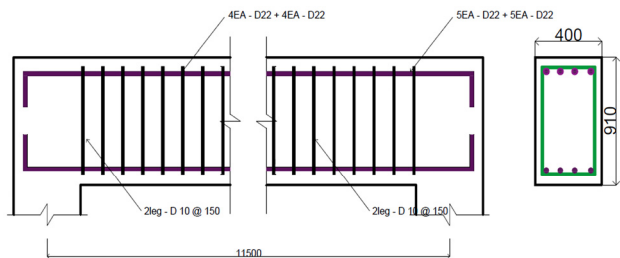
RC-BEAM Y1 Column Structure Drawing
